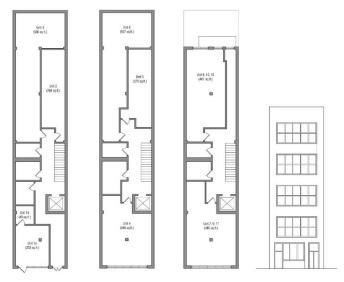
, 147, 148, 149 (left to right): Building 5, first (ground) floor (1930); second floor (1930); floors 3–5 (1930); street-front elevation (1974). For plans, north is down.
